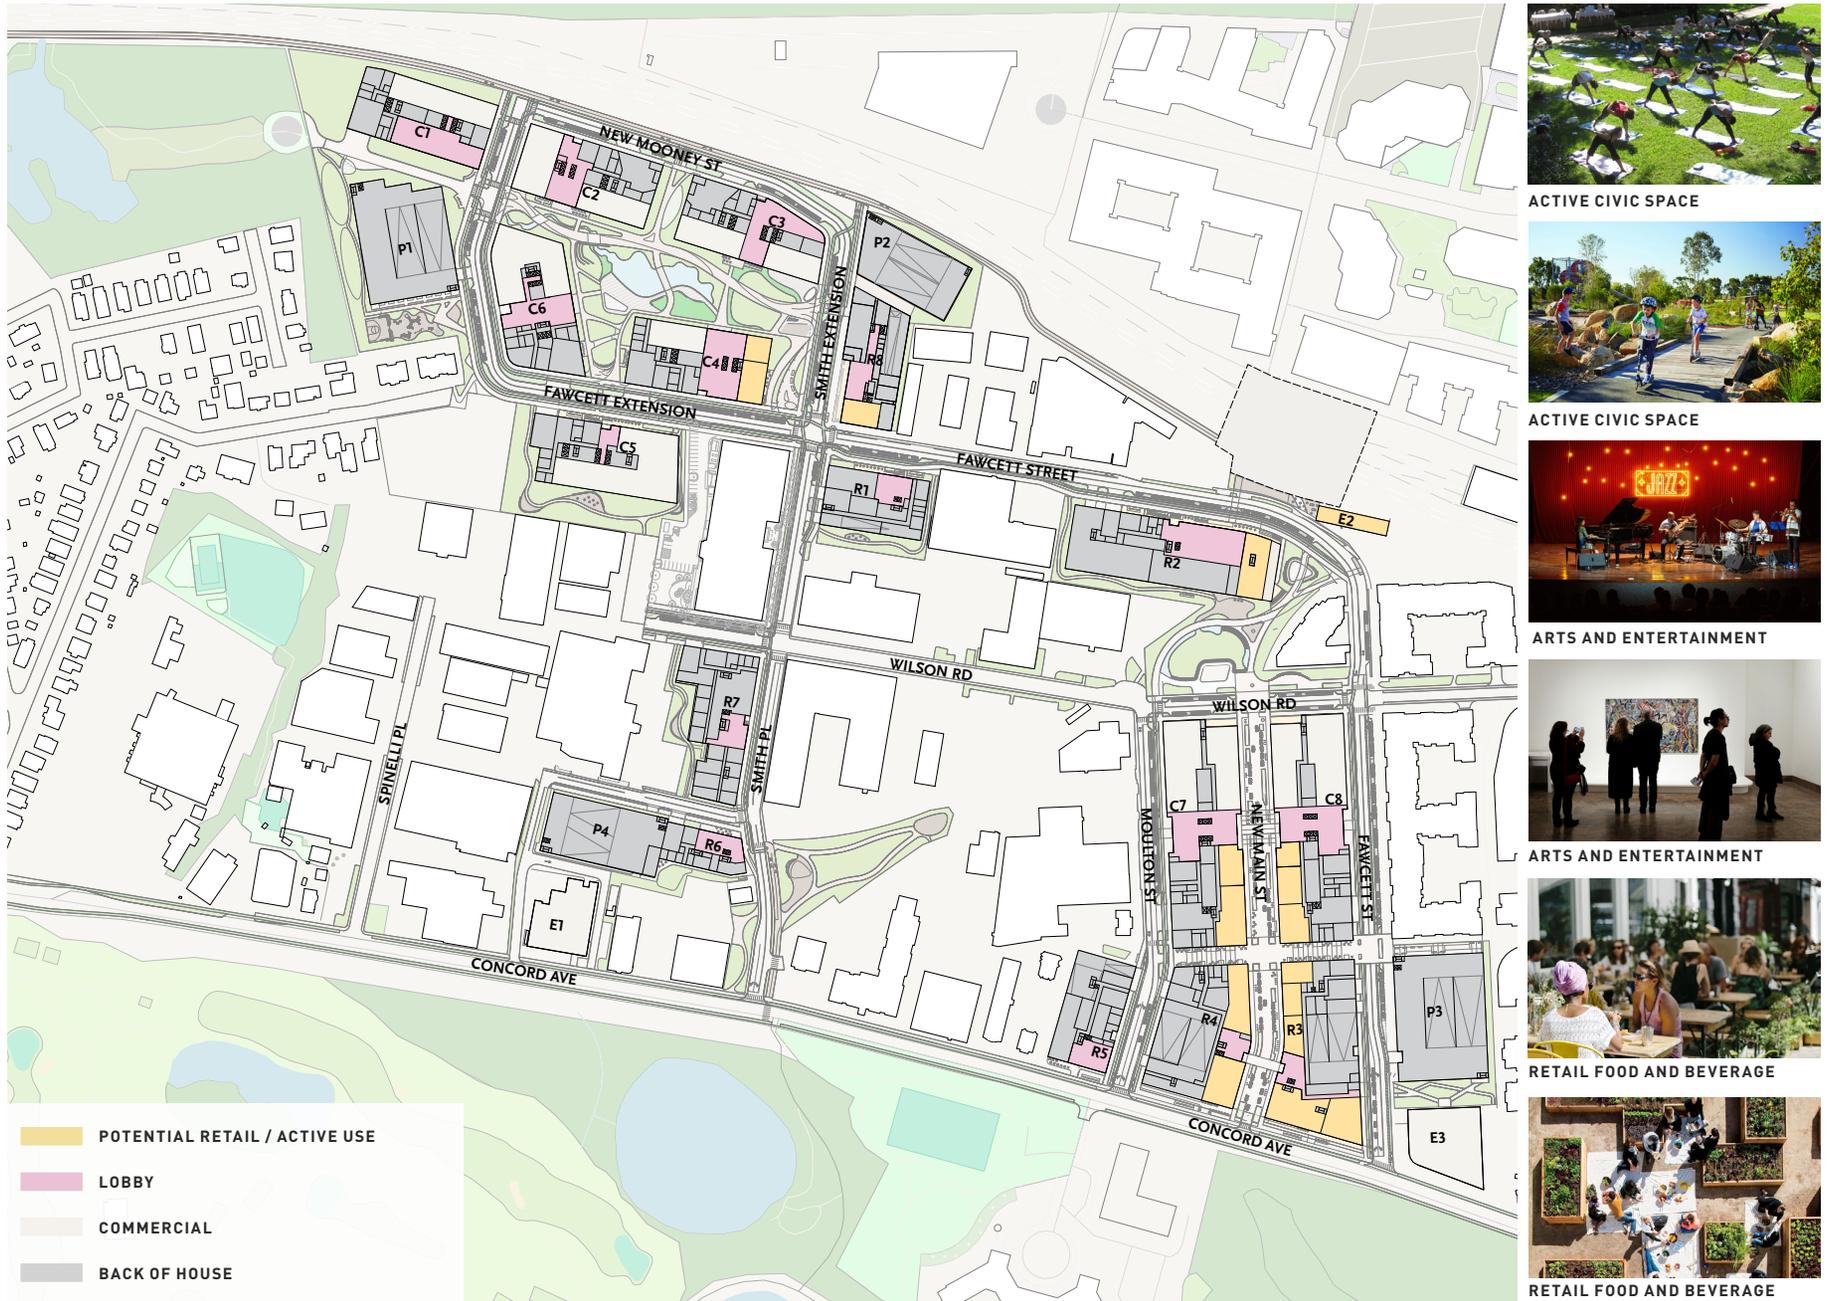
F.2: Ground Floor Activation - Proposed Conditions
